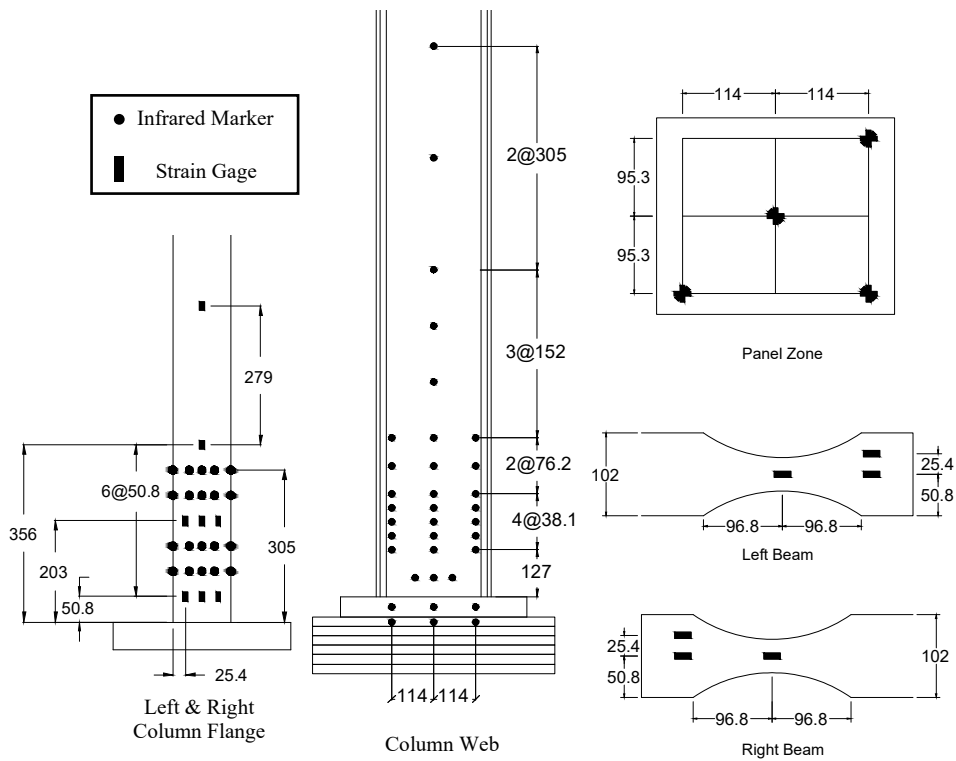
Placement of infrared markers and strain gages on the test specimen. Units: mm
